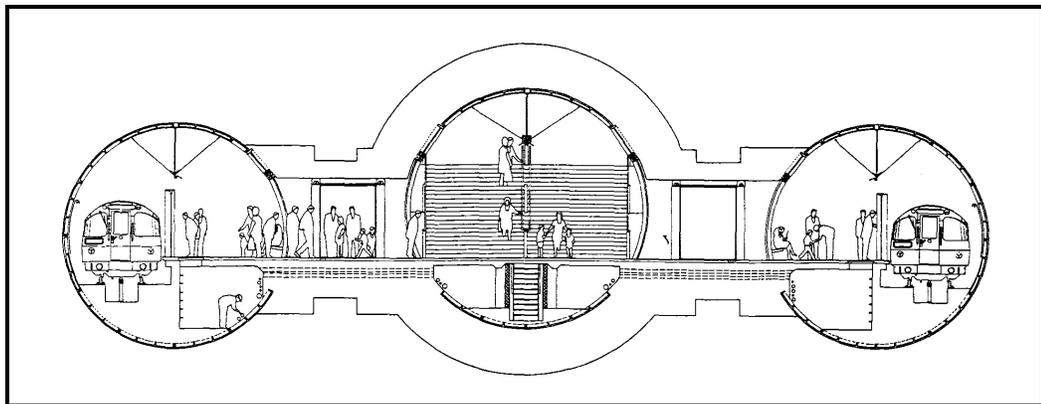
Tunnel type of station consists of two track tunnels with one platform in-between (Hackelsberger, 1997: 51).
